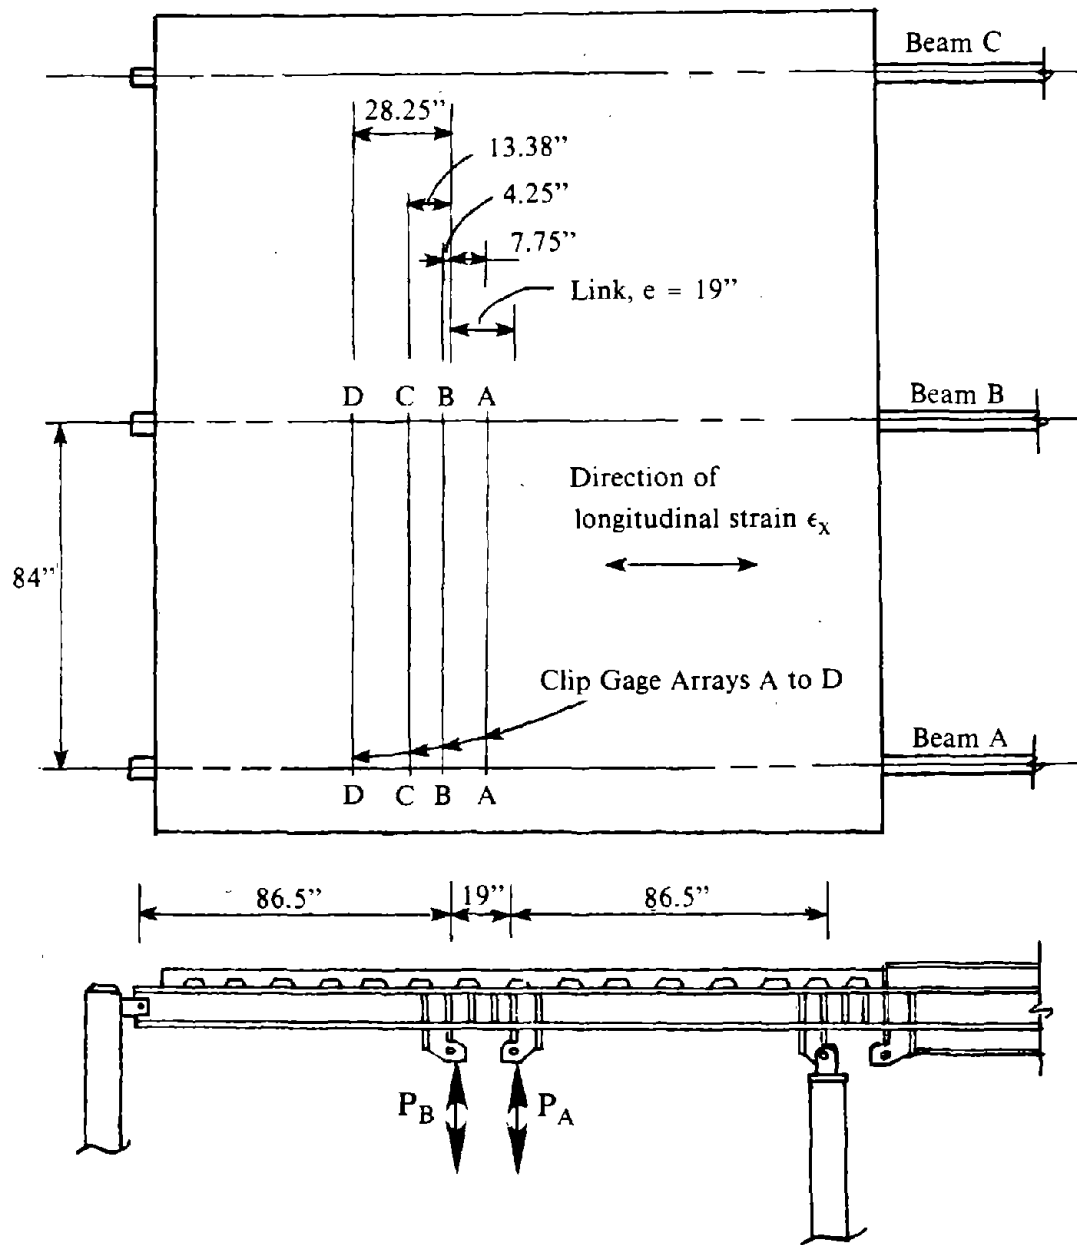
Clip Gage Locations for Specimens A1 and B1.
